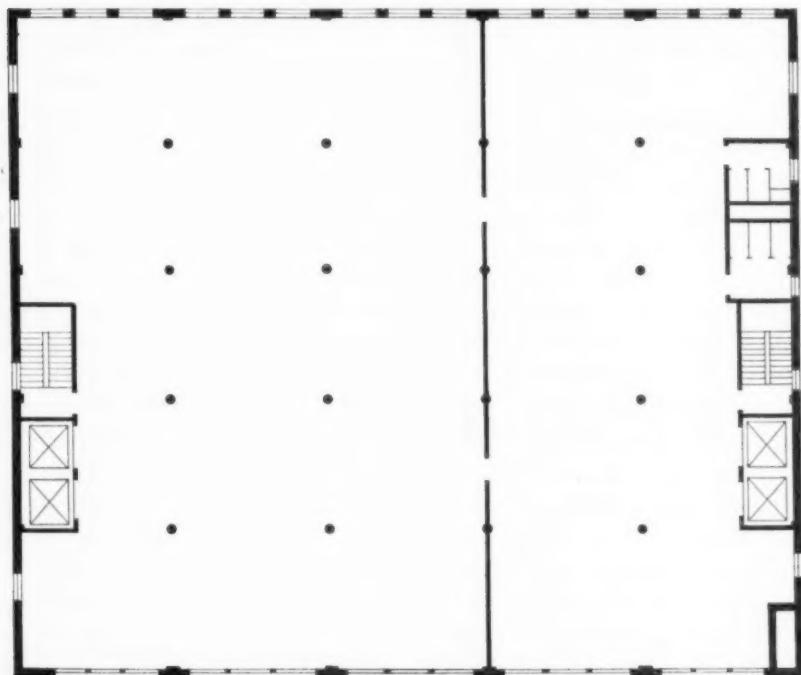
FLOOR PLAN OF TYPICAL LOFT BUILDING SHOWING FIRE WALL WITH DOORWAYS
